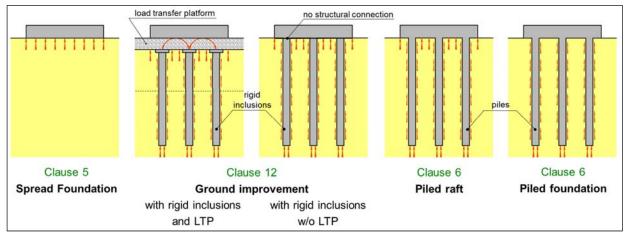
Stringent foundation design and verification concept for all types of foundation acc. to EN 1997-3:2025.
